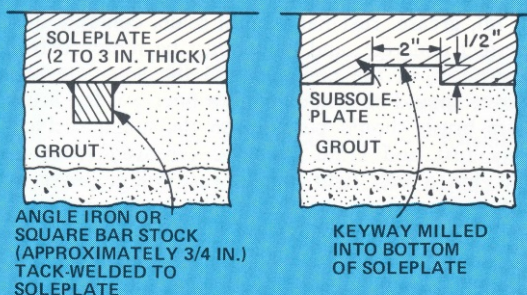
Additional horizontal restraint can be provided by tack-welded key or keyway milled into bottom of soleplate.
